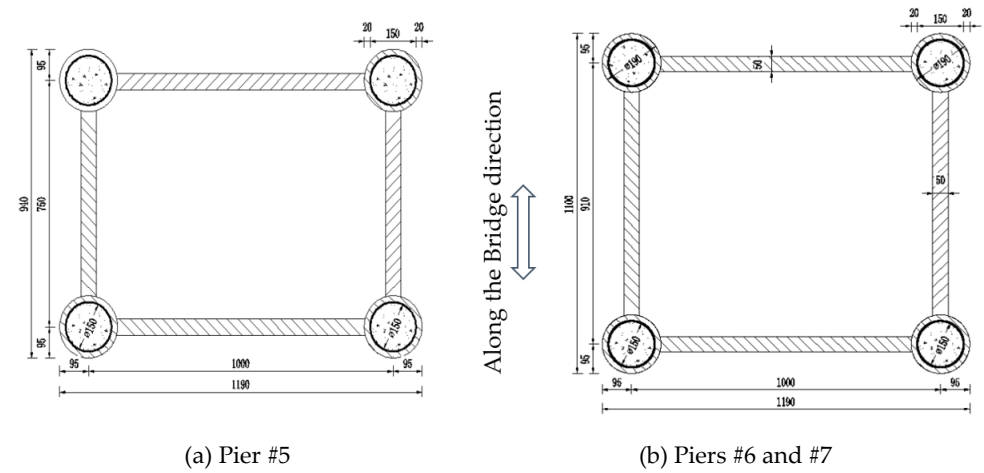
Section of concrete-filled steel tube lattice hollow thin-walled piers (Unit: cm)
